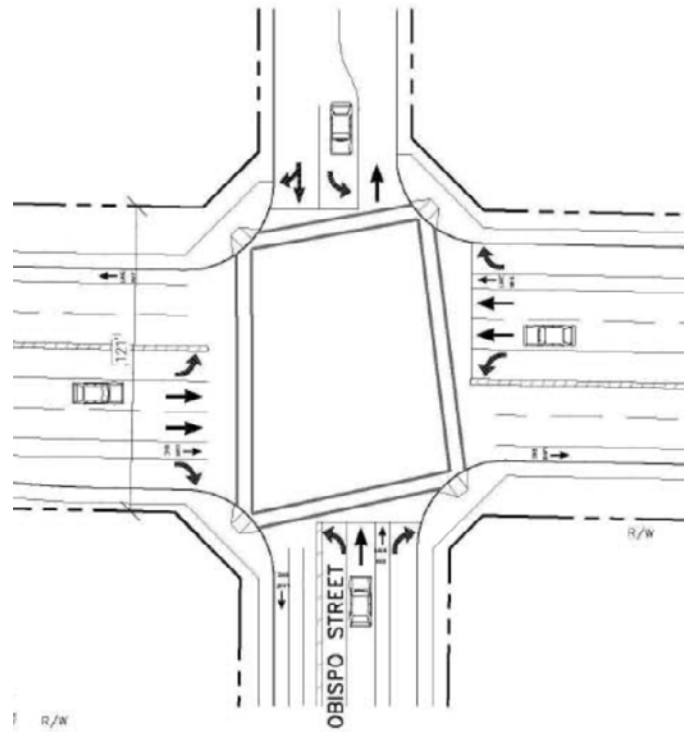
Typical configuration shown in the DJ Farms Specific Plan for the intersections of W. Main Street with Obispo Street and Flower Avenue.
